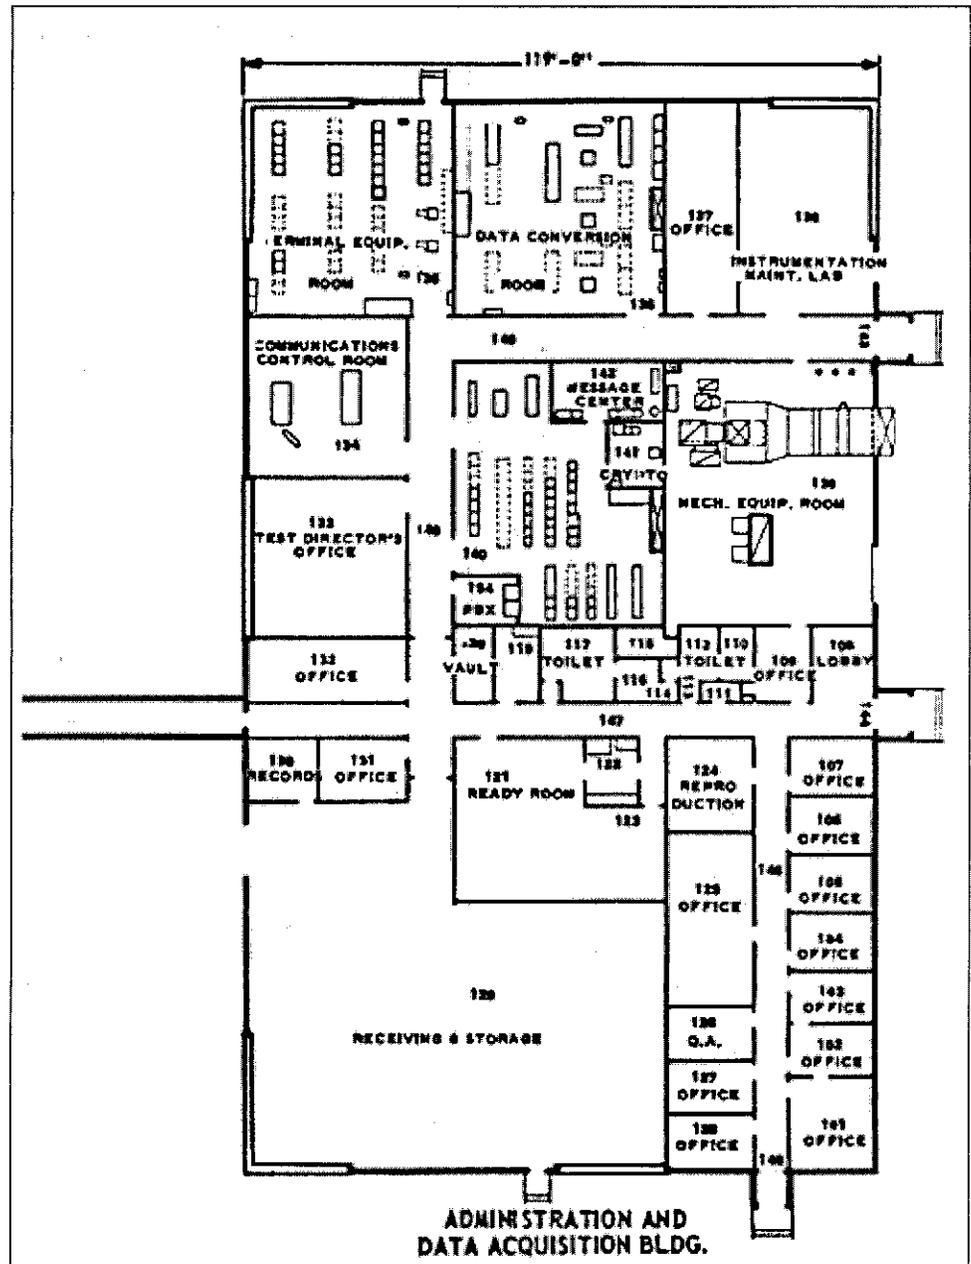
Floor plan for ADA bldg, Lockheed 1961, pg 4-505.
